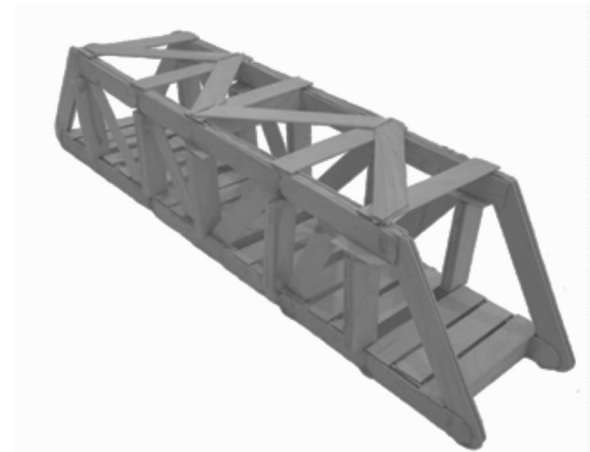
Team Truss Fall Bridge design based on 3D CAD modelling.
